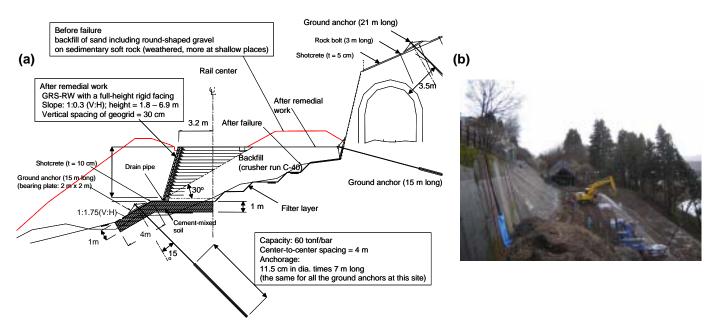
Site 3: (a) cross-sections before and after failure and after reconstruction of the railway embankment (photo courtesy of East Japan Railway Company); and (b) immediately before the start of reconstruction of a GRS retaining wall with a full-height rigid facing (5 December 2004, photo taken by F. Tatsuoka).
